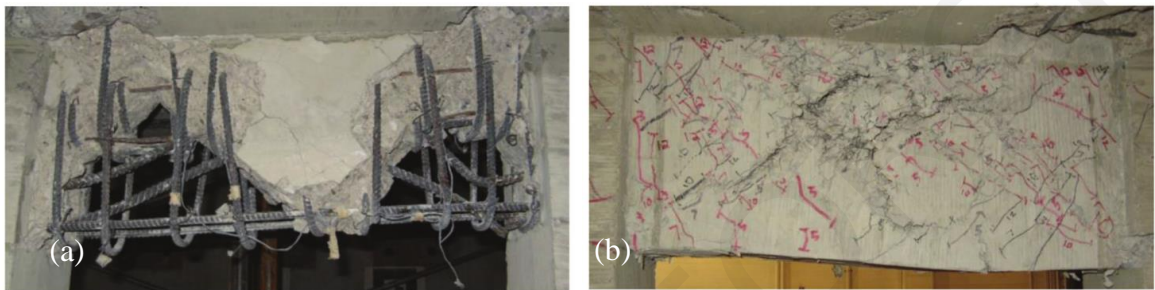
Coupling beams (a) reinforced concrete beam and (b) Strain Hardening Composite [162]
